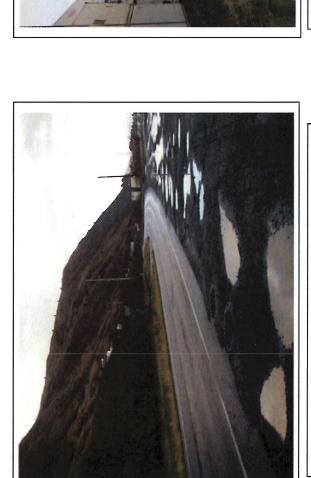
Looking SW down Rezanof from Station 125+00 failed SP off to right of photo.
